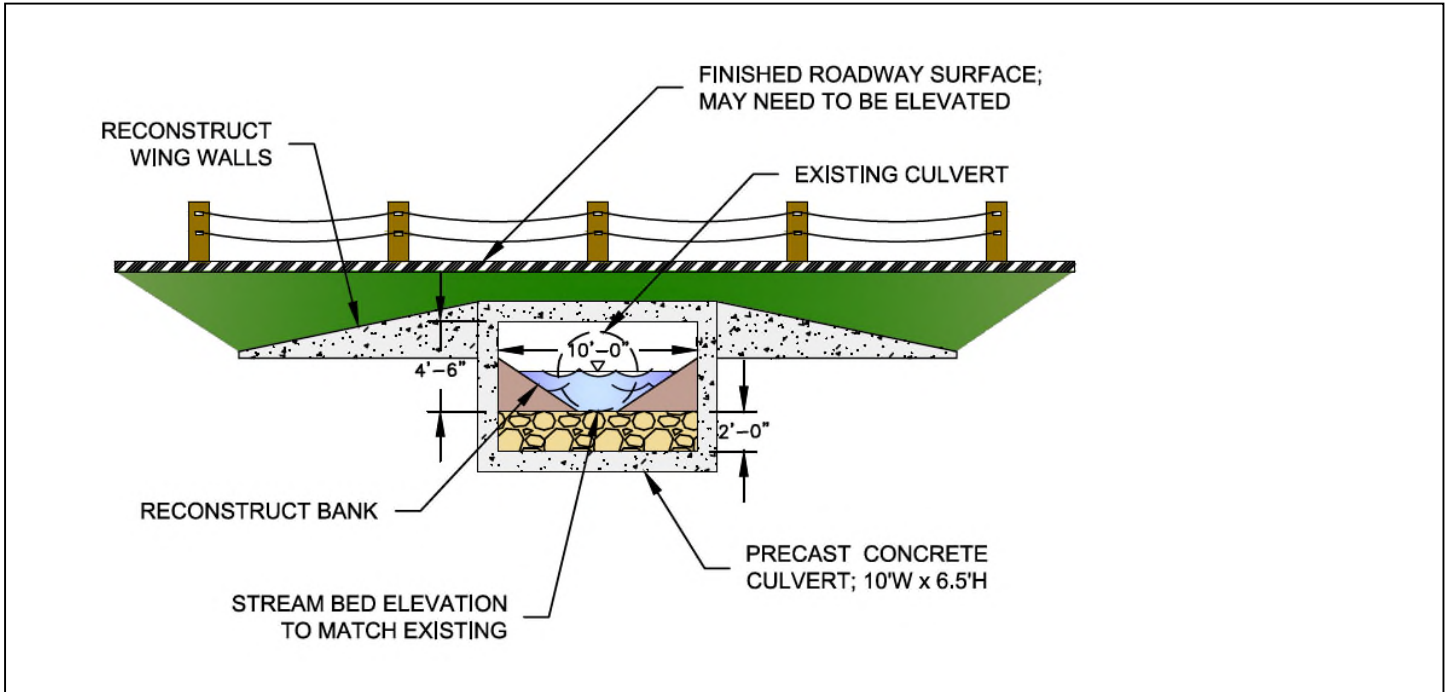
Conceptual Design for North Farms Road Culvert Improvement (Imagery © Google)
